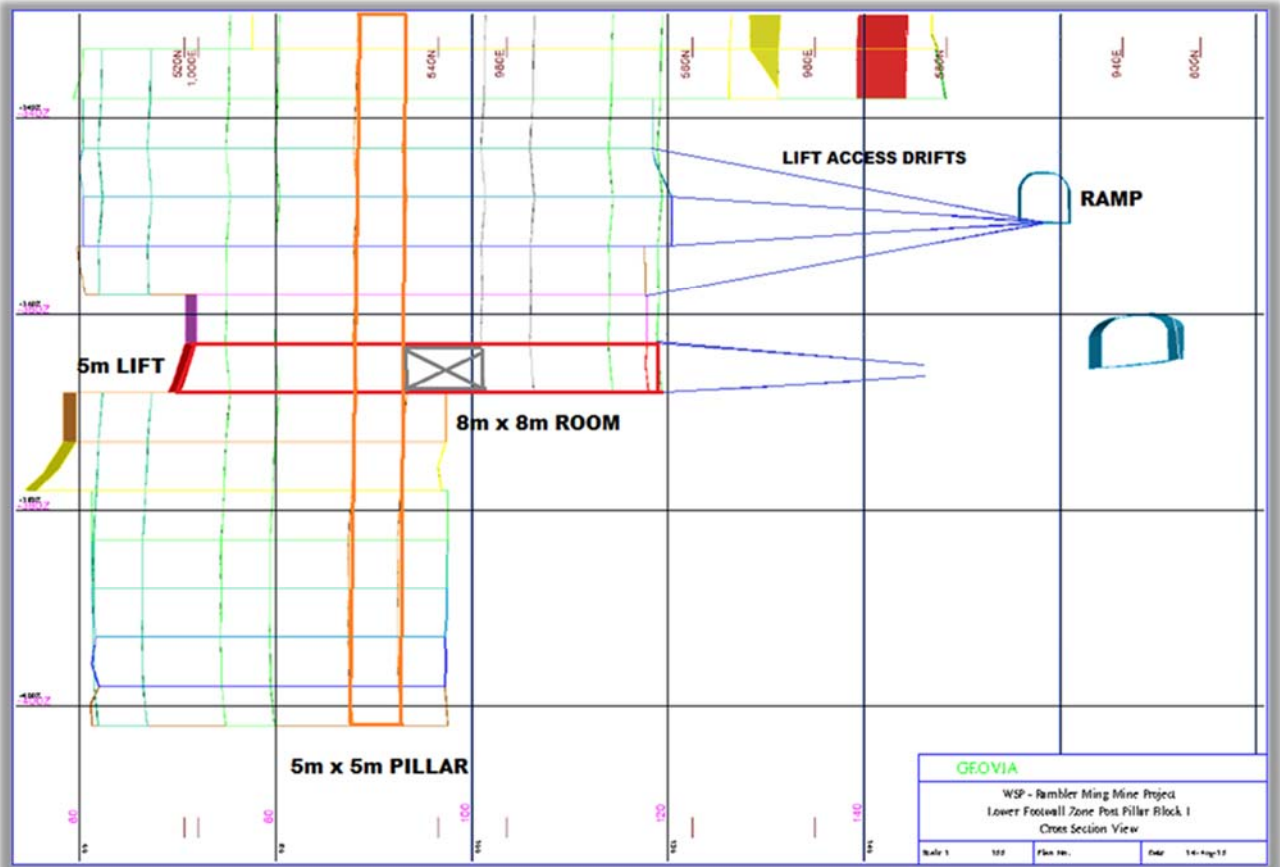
Cross Section - Post Pillar Cut and Fill
